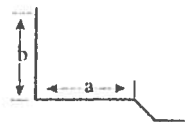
Sidewall flashing is applied when the side of the roof butts up against an adjacent wall. The wall-side of the flashing can either be covered over with siding or sealed with counterflashing. Butyl tape should be applied where the "foot" of the flashing attaches to the roof, and, if used, along the top edge of the counterflashing.
